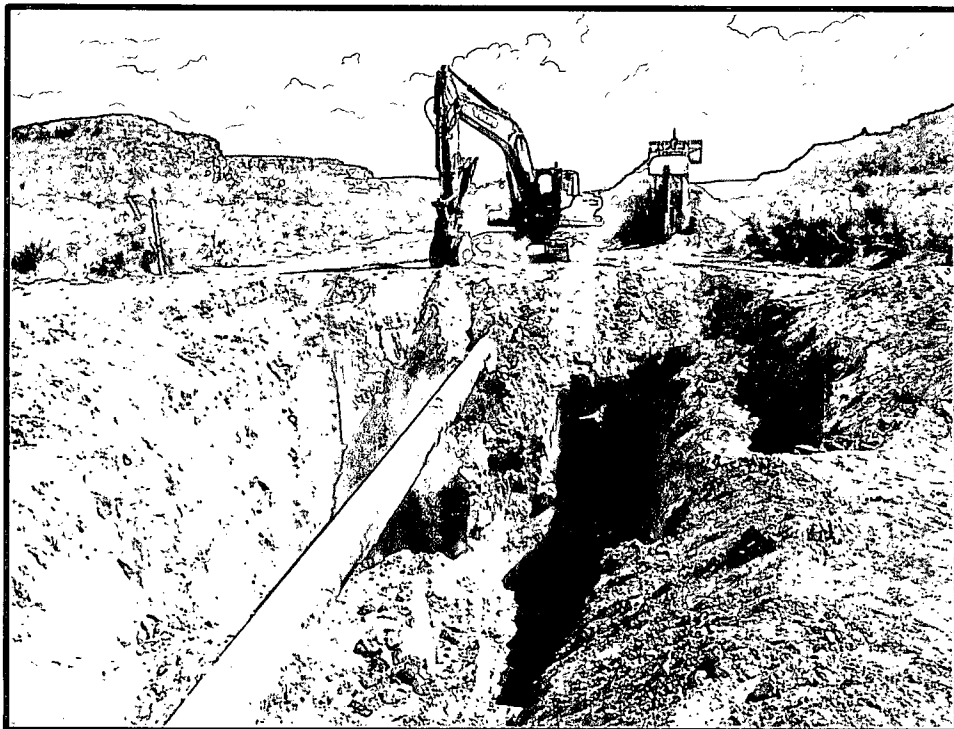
Near complete excavation of the Trunk K #5 pipeline release site.
